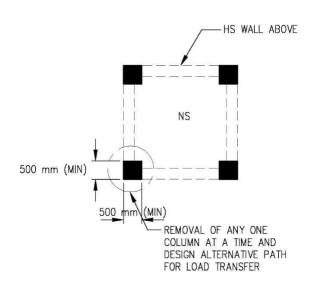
SHIELDED NS WALLS AND/OR NS COLUMNS
